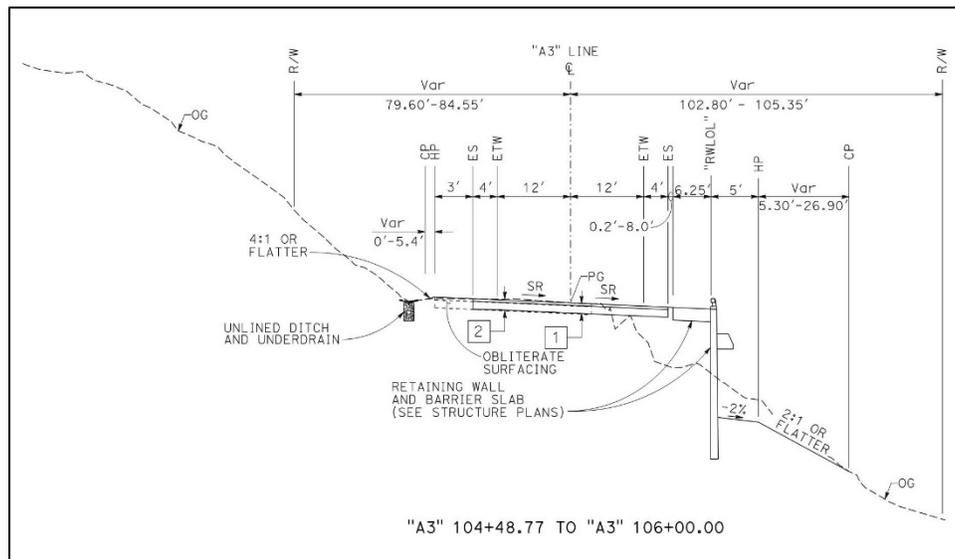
Example 1: Typical cross section for the proposed roadway
